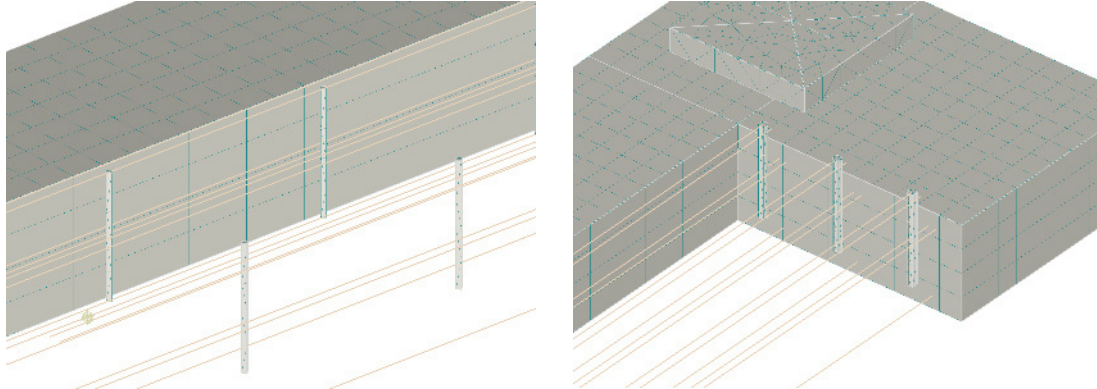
Modelled shear dowels (left) and anchoring of longitudinal reinforcement (right).
